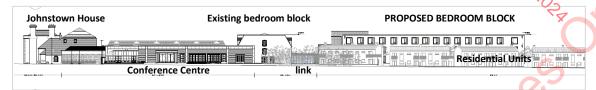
Contiguous elevation showing the proximity of the new block to Johnstown House.
